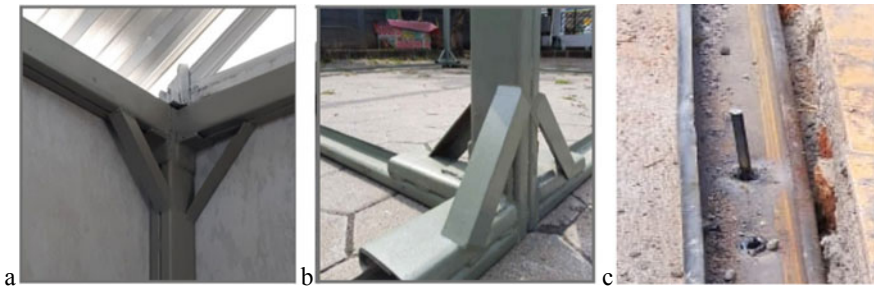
a Beam column connection; b Sloof column connection; c Sloof shear connector [23]
